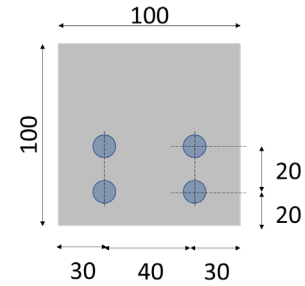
Geometry of the concrete beam cross section with embedded tendons.
